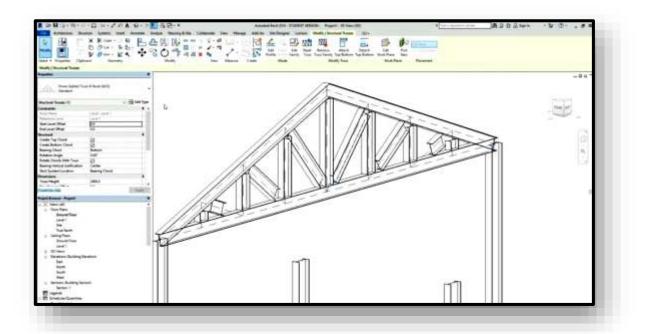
A 3D truss model showing internal components like arrangement of truss and connection between bays
